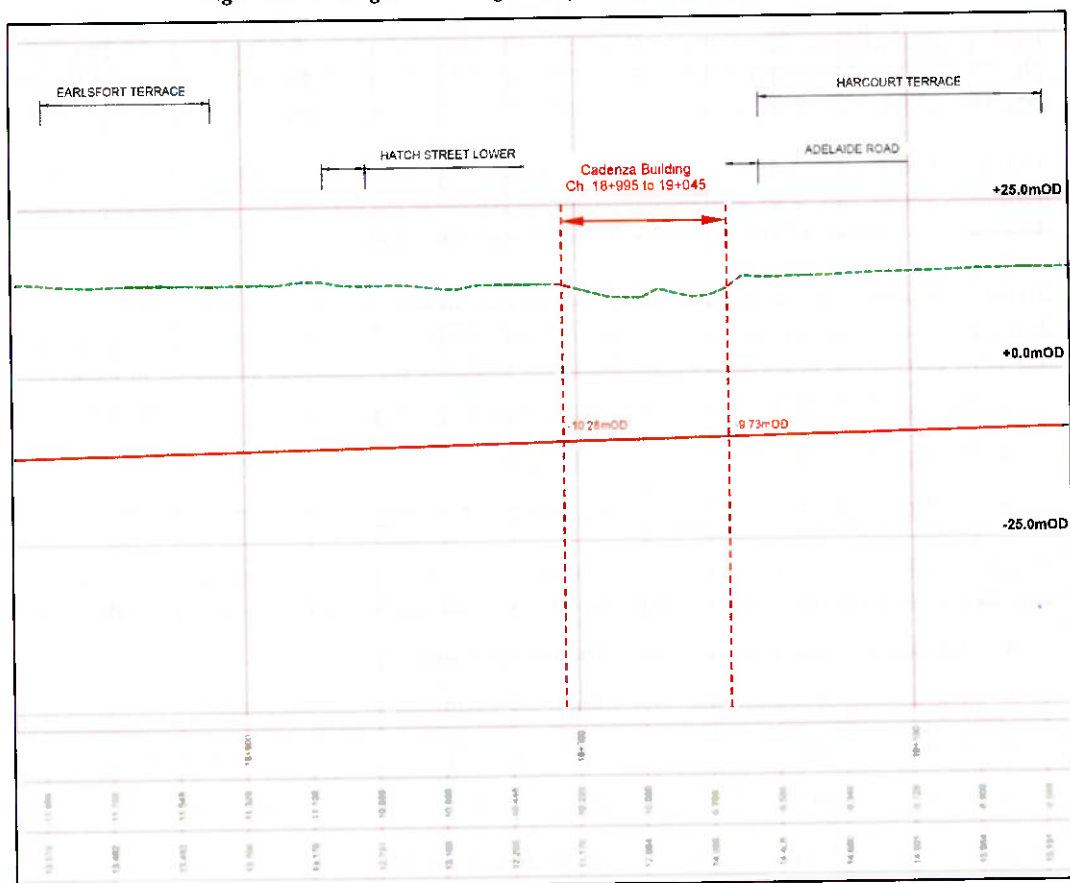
Design tunnel profile (top of rail level) from RO Long-Section Drawings
